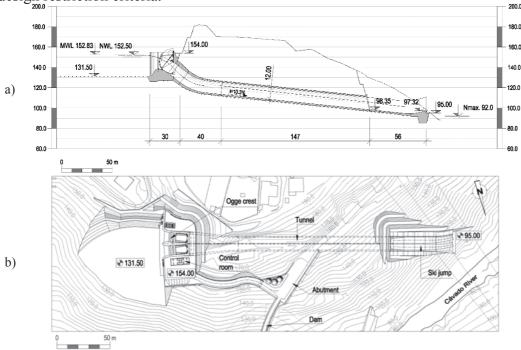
Complementary spillway: a) longitudinal profile view; b) horizontal plan view.
